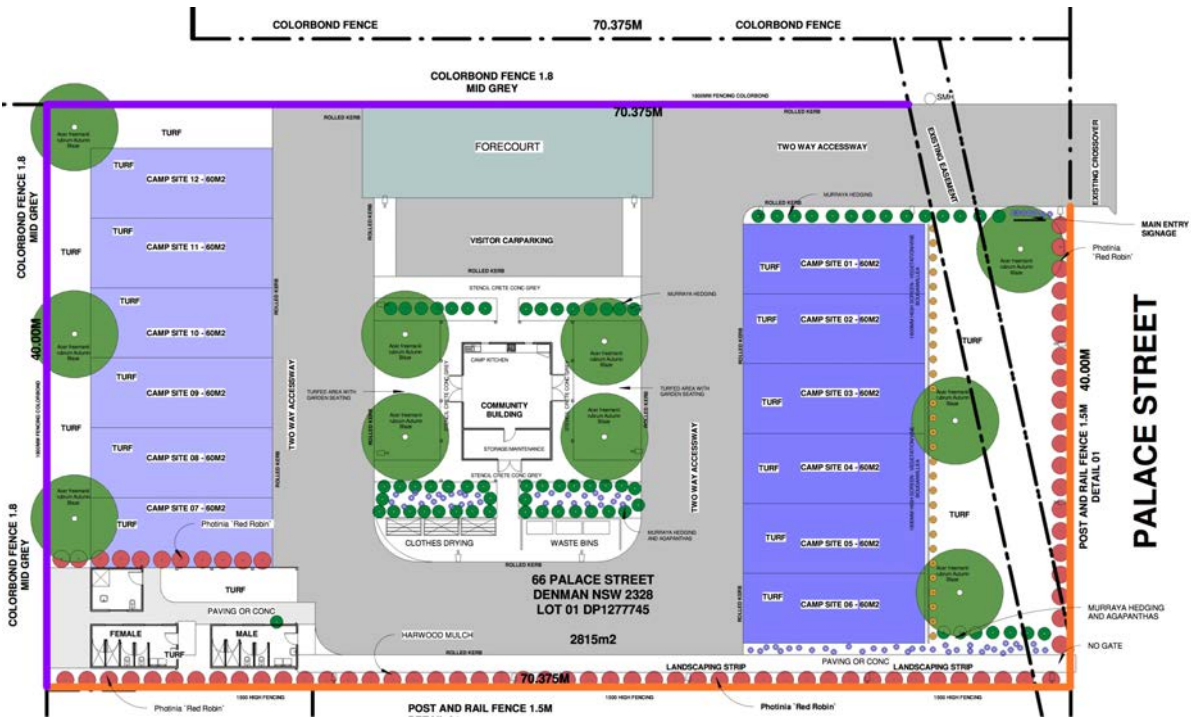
Site and Landscaping Plan. Source: PLAY DESIGN STUDIO
